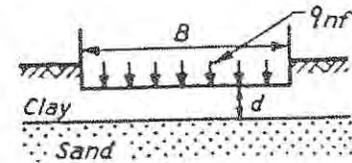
FOUNDATION ON THIN CLAY LAYER
